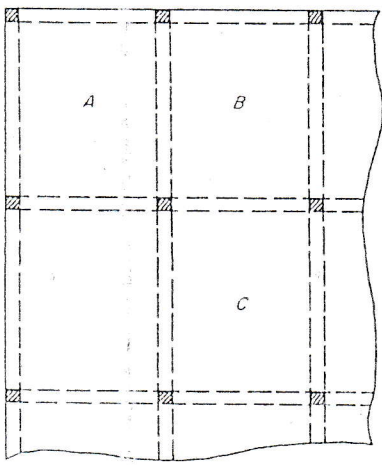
Portion of typical two-way slab floor with beams on column lines.
